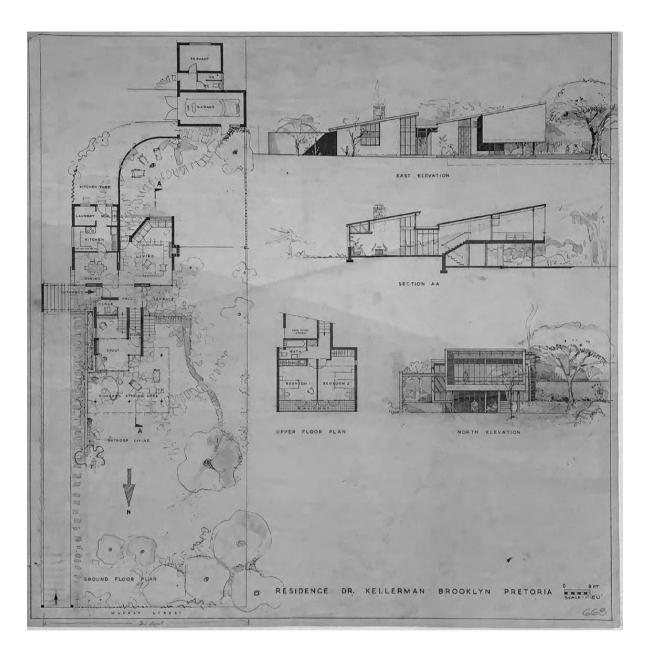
House Kellerman, Brooklyn Pretoria 1950 and 1959, Architect Hellmut Stauch. Ground floor and upper floor plan including east elevation plan and section. Northern elevation with all living areas benefitting from northern light. Courtesy of the Architecture Archives, Pretoria University.
